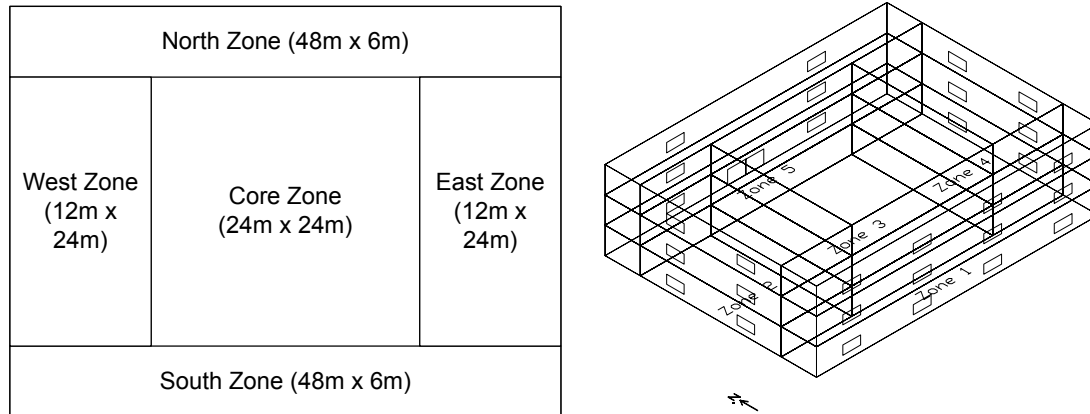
Plan View (left) and Isometric View (right) of Office Building
